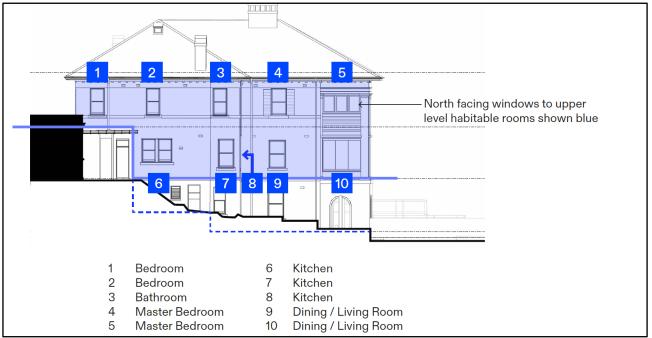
Affected north facing windows at 26-28 Wolseley Road. Source: Objection
